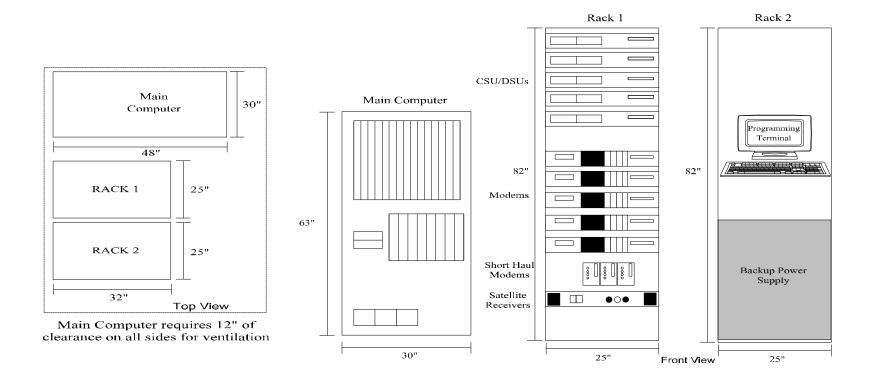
(Concept) Rack Elevation (Multiple Airport Facility)
